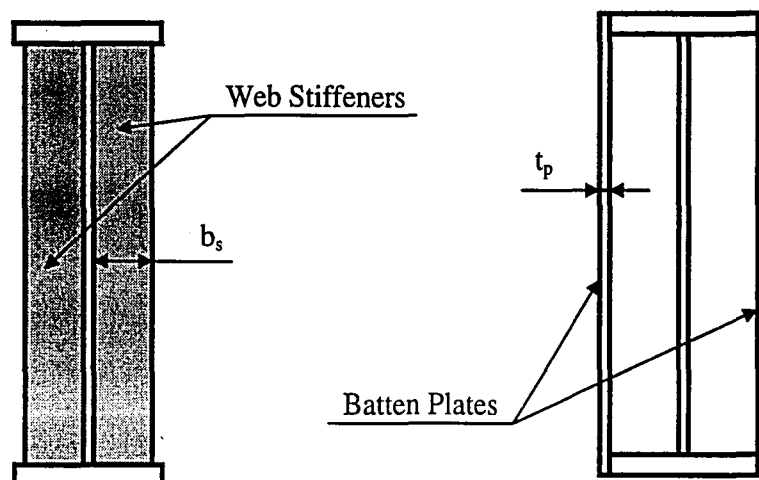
Web stiffeners and batten plates (after Takabatake (1988))
